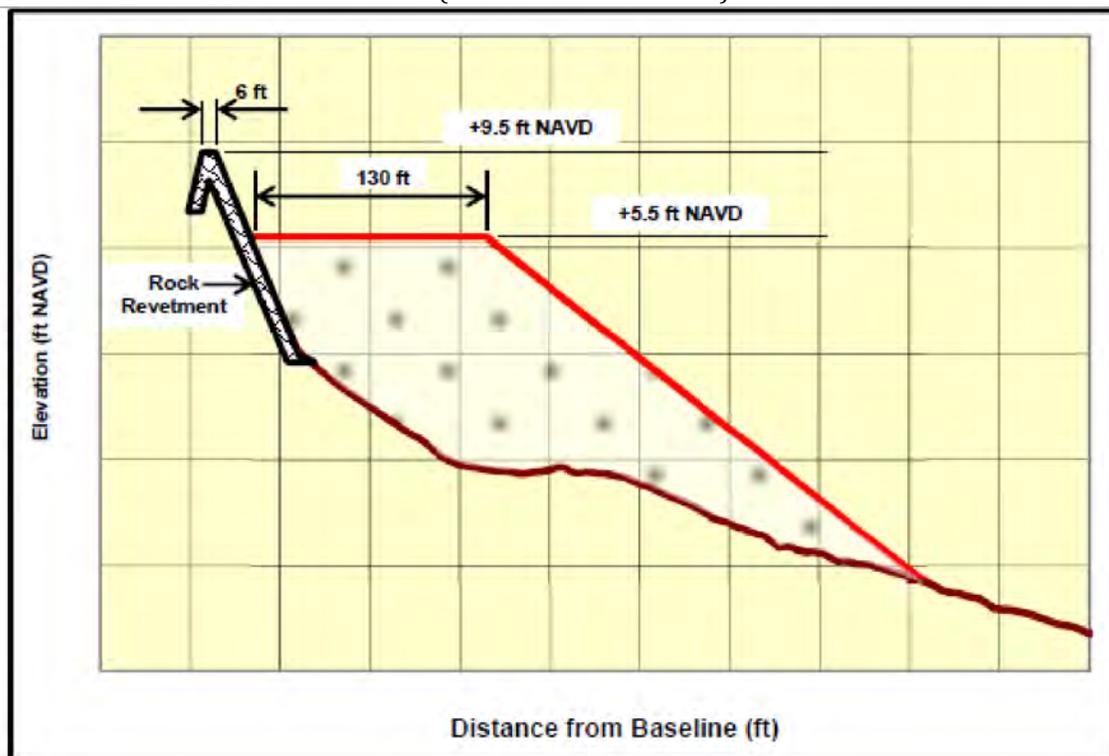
Rock revetment cross-section (stations 116+40 to 137+20)
